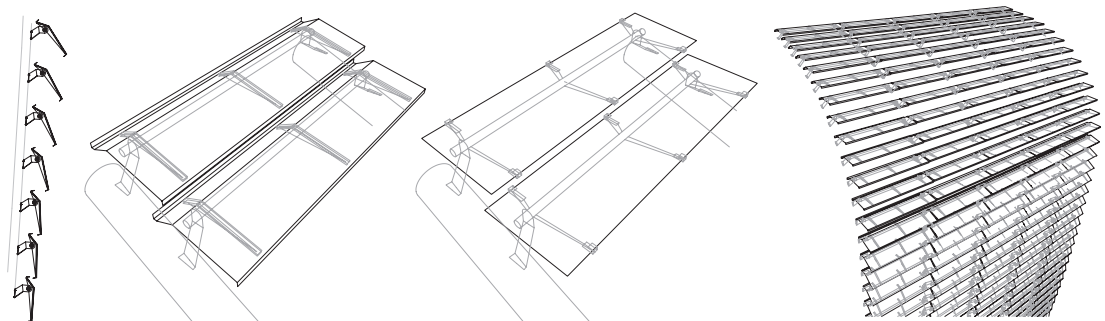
Left to right: Facade section. Polycarbonate panel assembly. Glass panel assembly panels. Panels on facade
